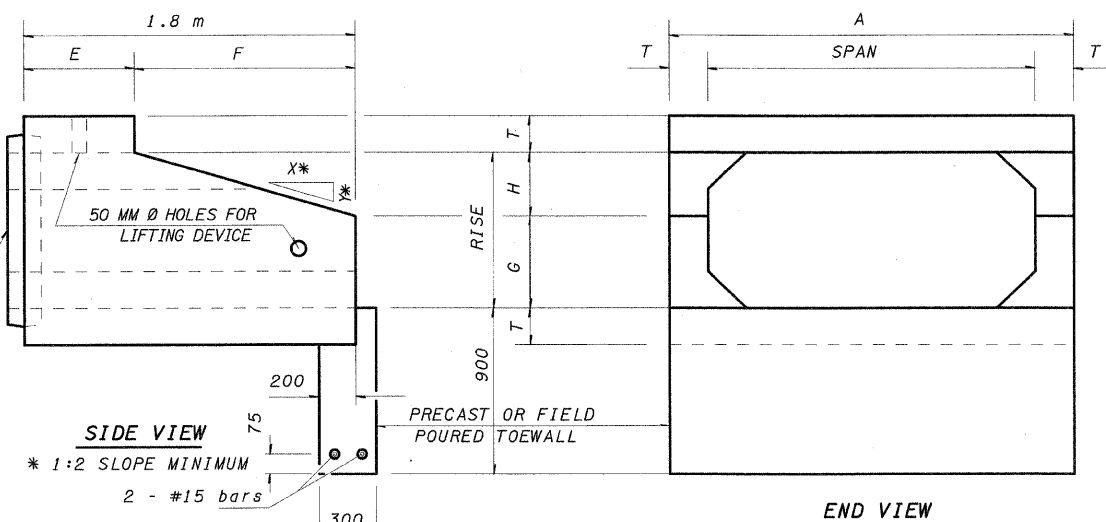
# DETAIL OF PRECAST CONCRETE BOX CULVERT END SECTION
